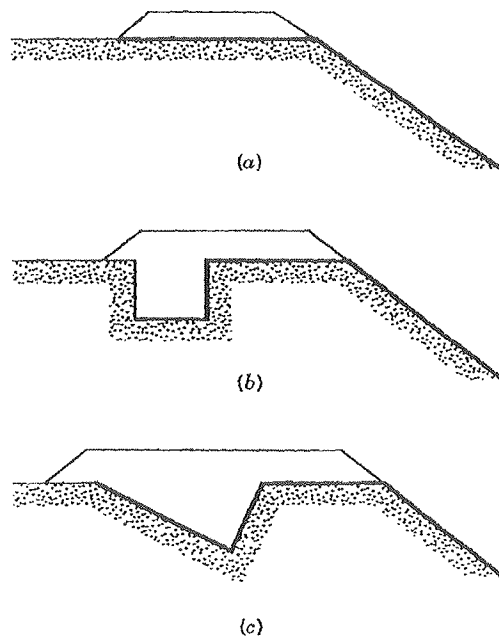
Typical anchor trench configurations: (a) flat anchor; and (b) rectangular anchor; and (c) V-shaped anchor.
